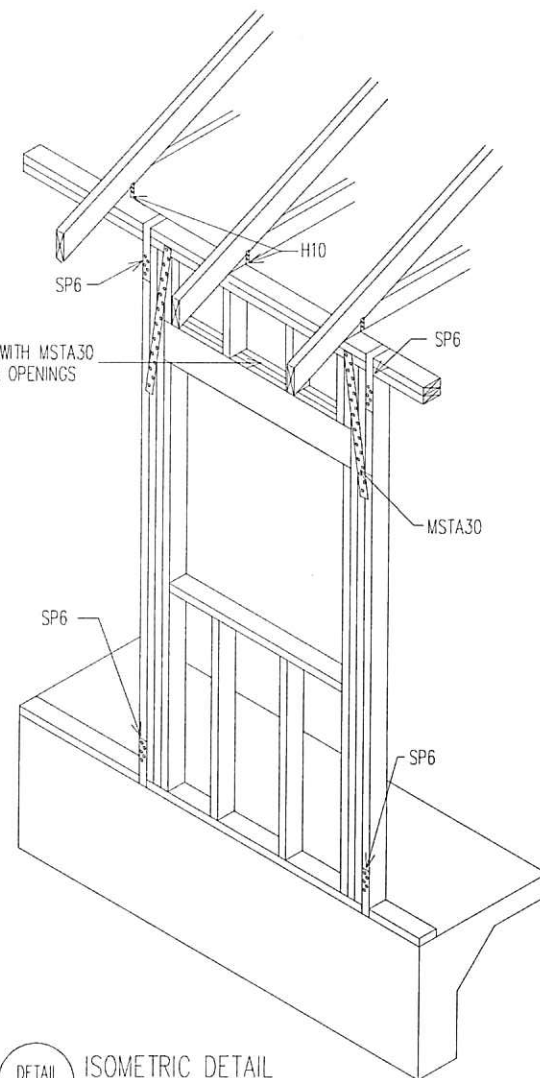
DETAIL "B" WALL SECTION FOR 120 WINDLOAD
